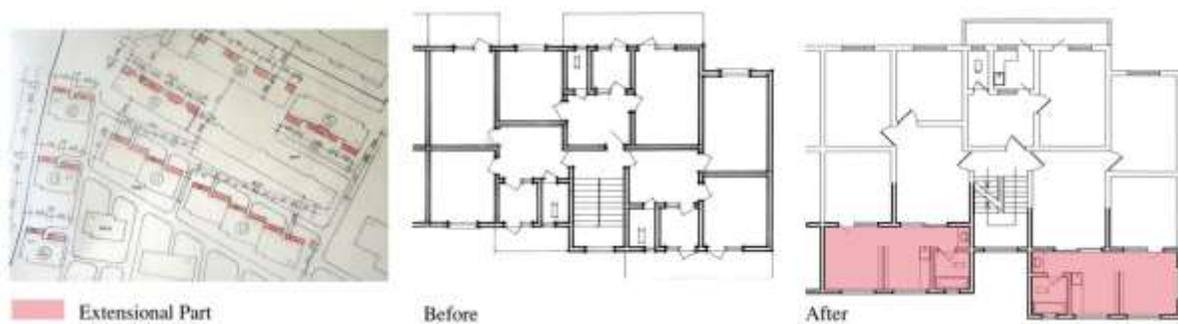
The plan of staff apartment renovation in Sichuan Hospital
